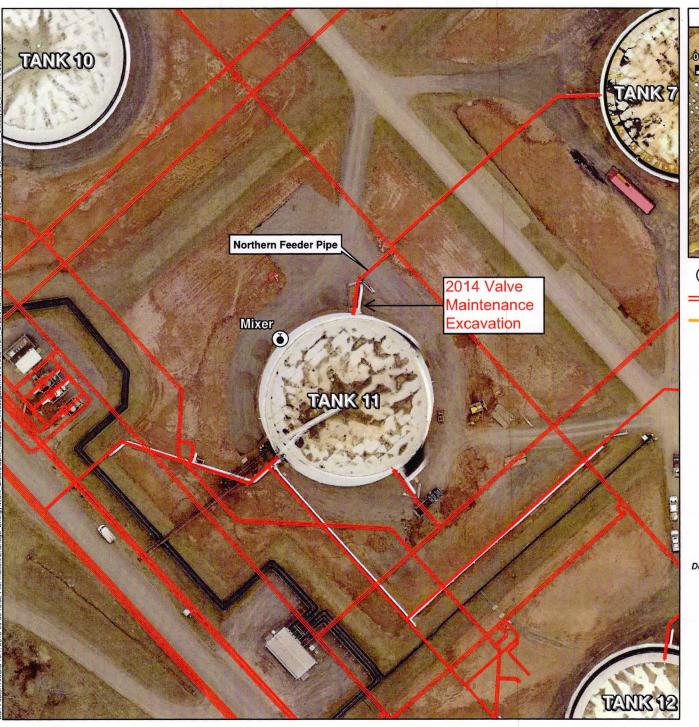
2014 Tank 11 valve maintenance excavation site. 7/8/2014
